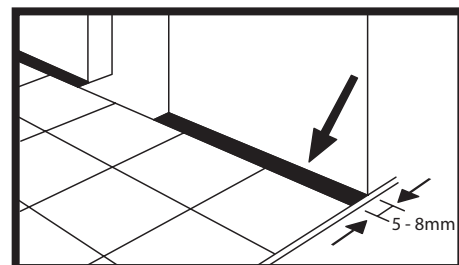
Around fixed elements of the supporting surface, such as walls, steps, columns, etc., it is mandatory to install 5-8 mm peripheral joints.
